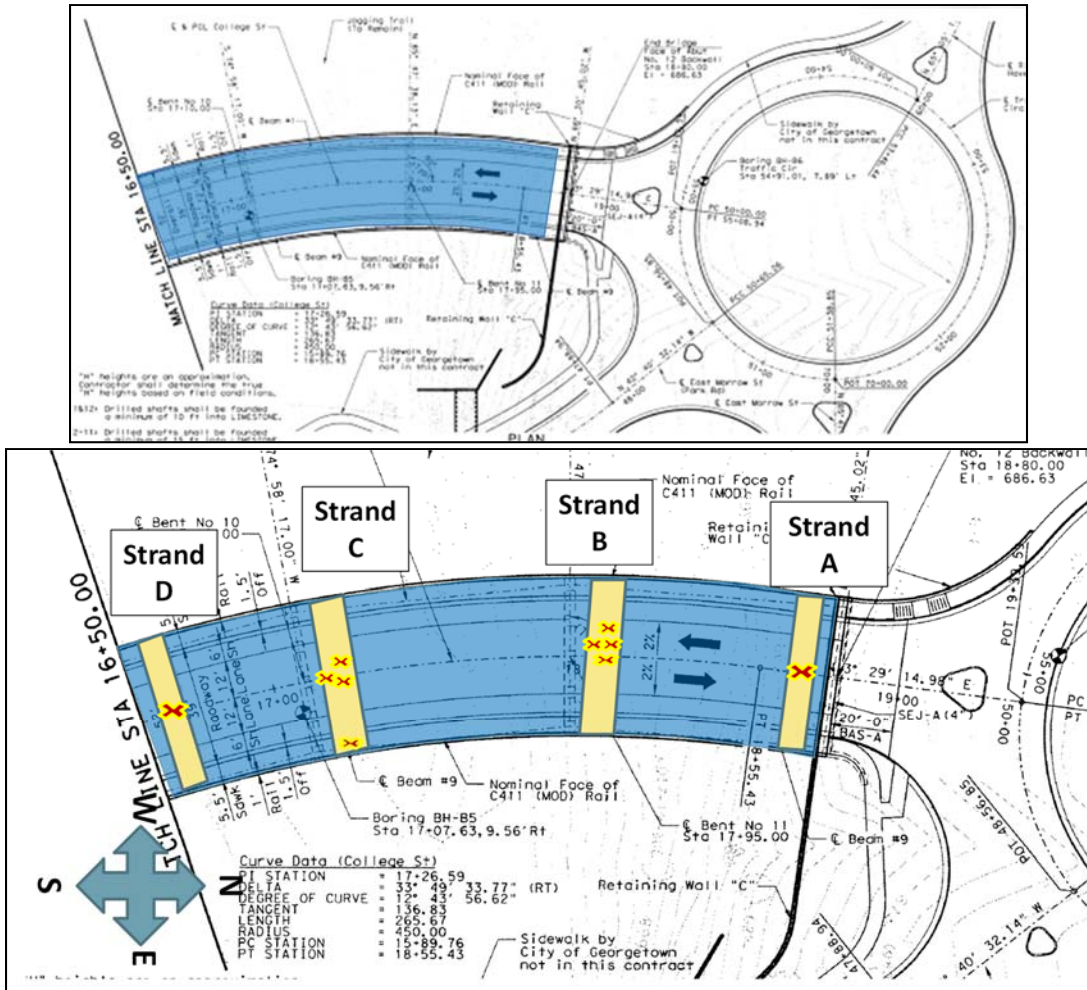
iButton string layout for Georgetown bridge deck winter pour.
